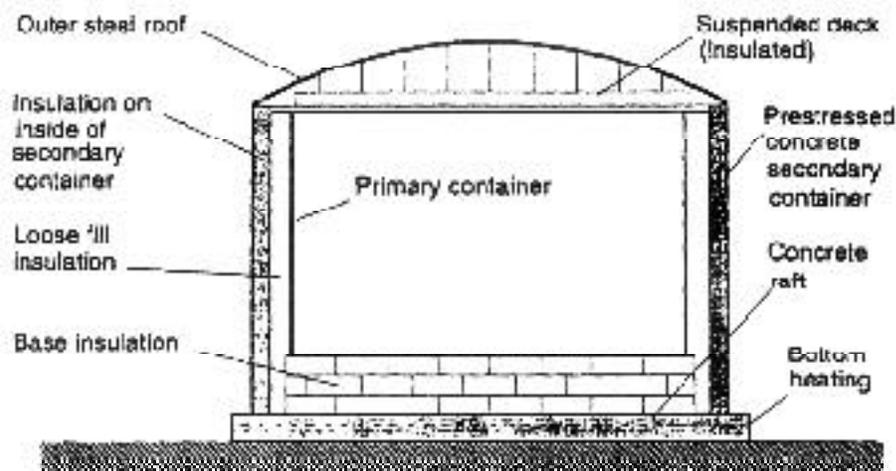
The primary and secondary containment tanks for a "full containment" storage tank of the type to be used at the proposed Harpswell LNG terminal.
